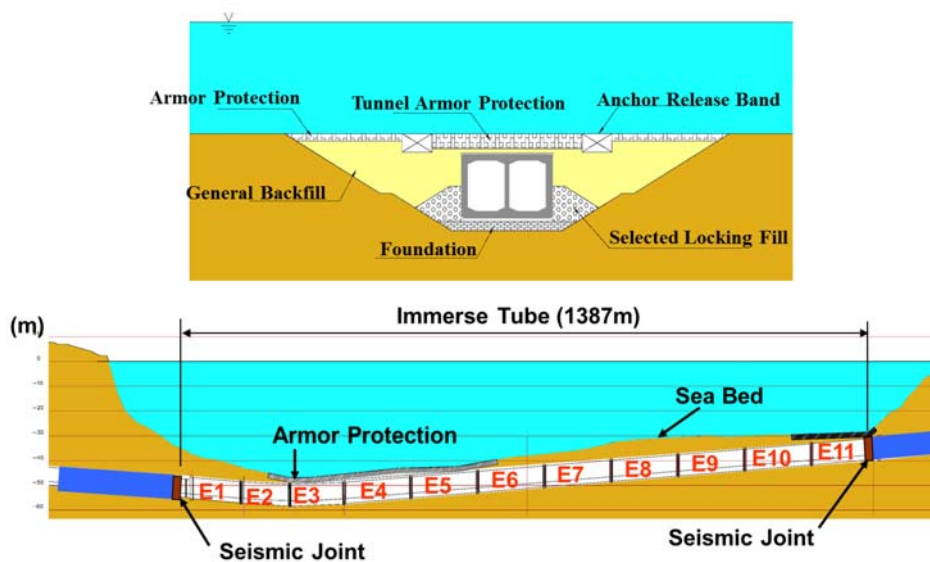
Longitudinal and transverse sections of the immersed tunnel
